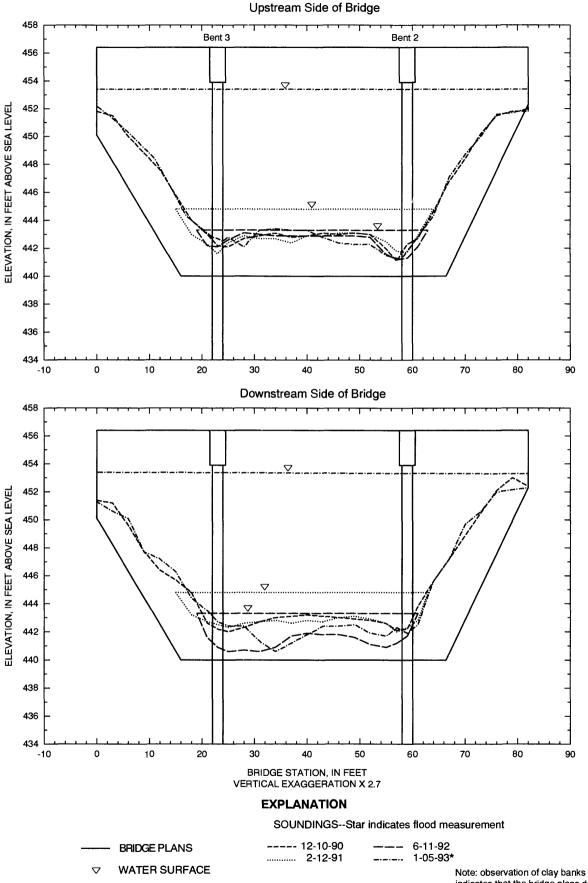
Cross sections showing bed elevations from bridge plans and soundings, State Road 54 over Busseron Creek near Sullivan, Indiana.
